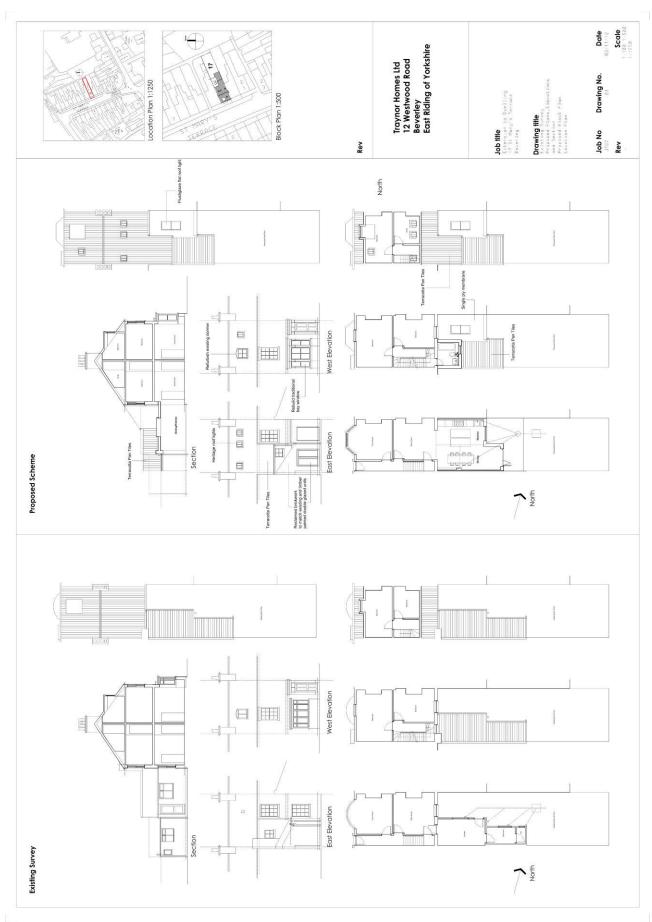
SITE LOCATION, AS EXISTING SURVEY AND SITE AS PROPOSED (not to scale - plan supplied by Traynor Homes Ltd)
